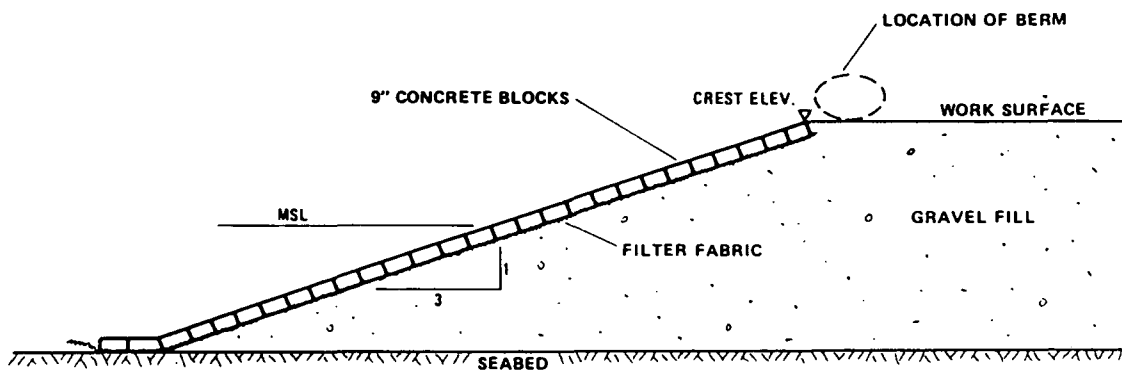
CROSS-SECTION OF THE 1V:3H CONCRETE BLOCK SYSTEM CONCEPT
